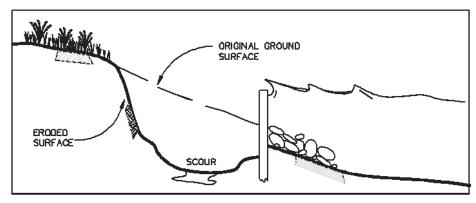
VERTICAL PROTECTION USING RETAINING WALL
